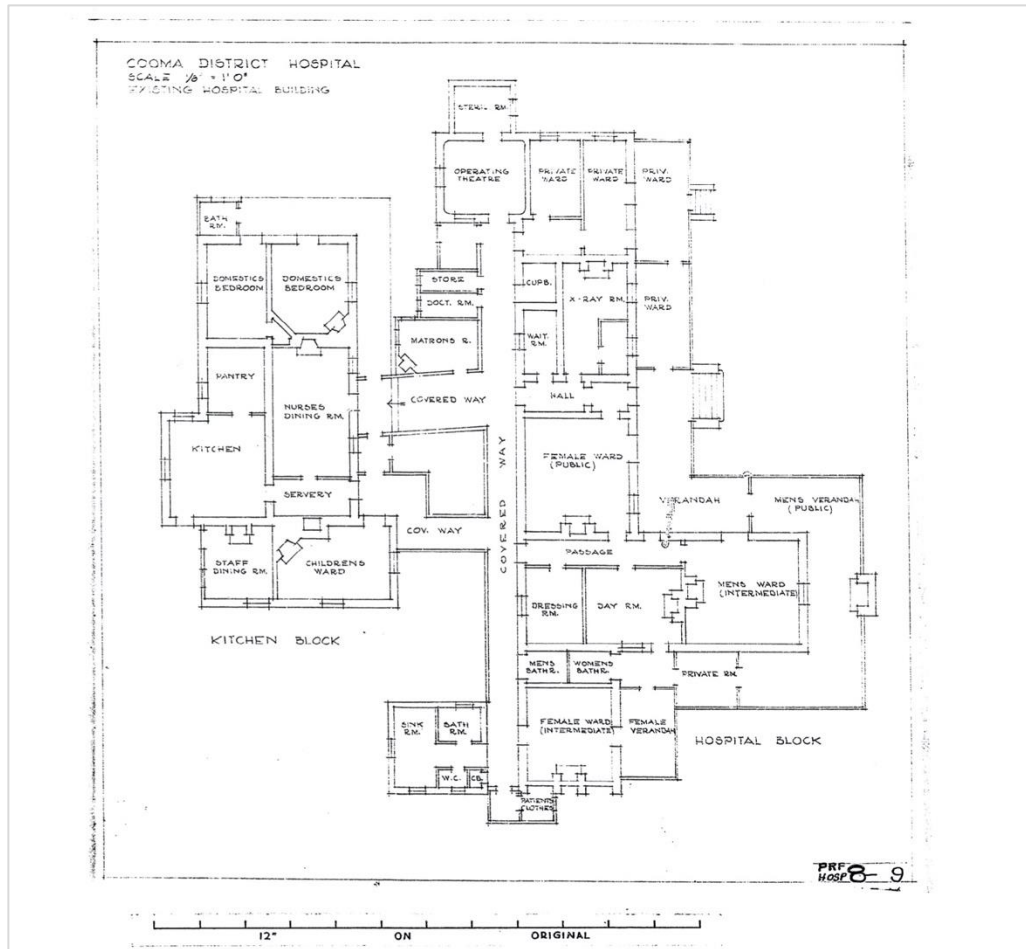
Undated floor plan for the Cooma Hospital, showing room configuration and uses at that time. The plan was likely prepared during the late 1940s (Source: NSW Plan Services (PWA), PRF-PH8-9, Cooma Hospital – Main Block – Floor plan)
